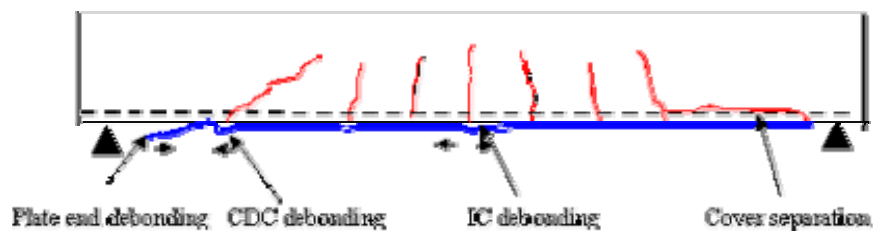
Debonding failure modes in flexurally-strengthened RC beams
